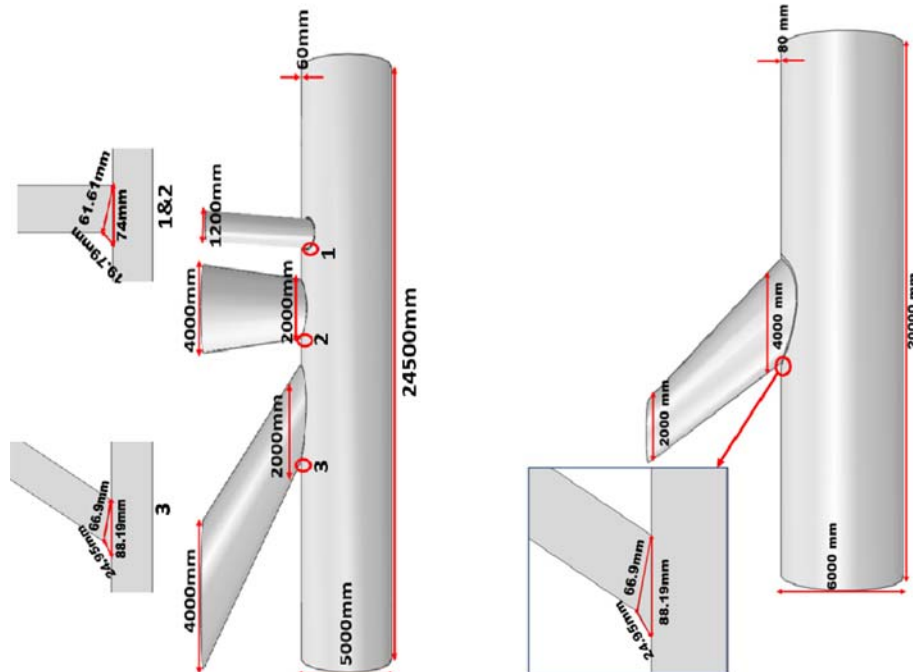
Dimensions of Tripod Tubular Joints (Y type)
